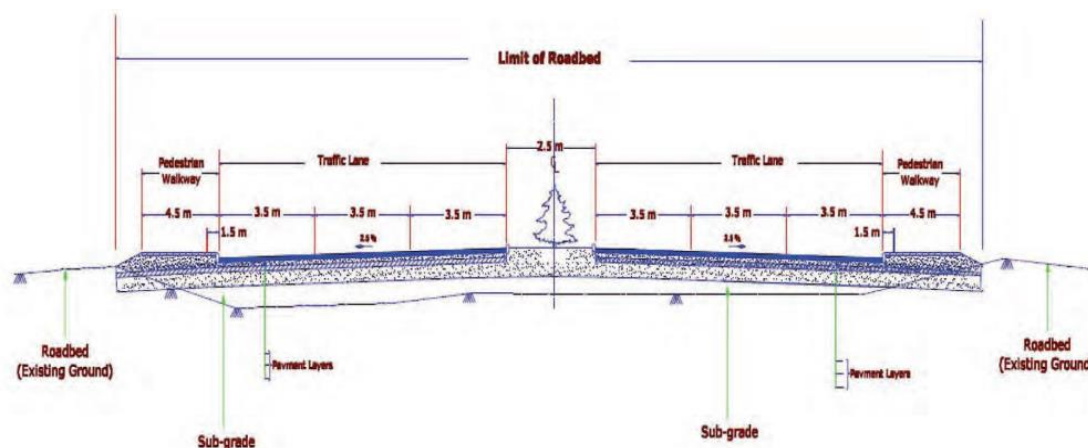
Divided Three Lane (Addis Ababa) Typical Town Section
